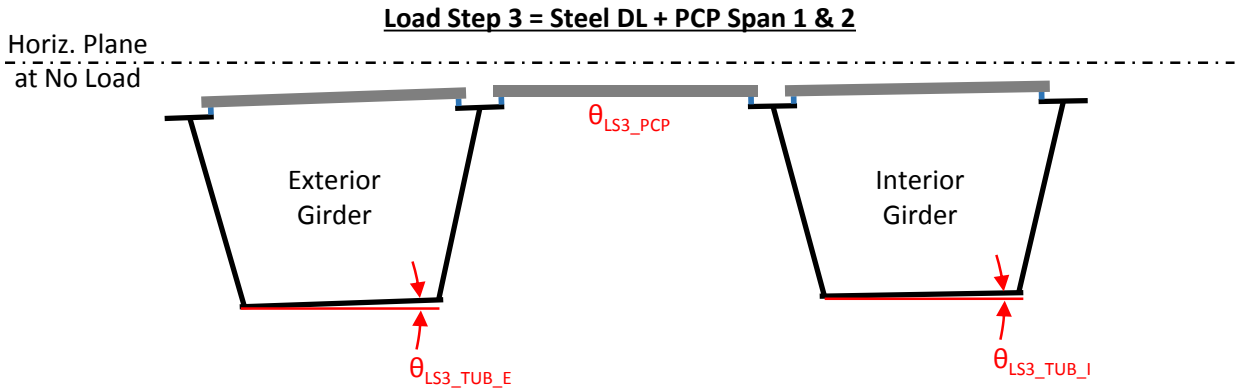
Load Step 3 – Unconnected Steel Tub Girder Twist – Section A-A
